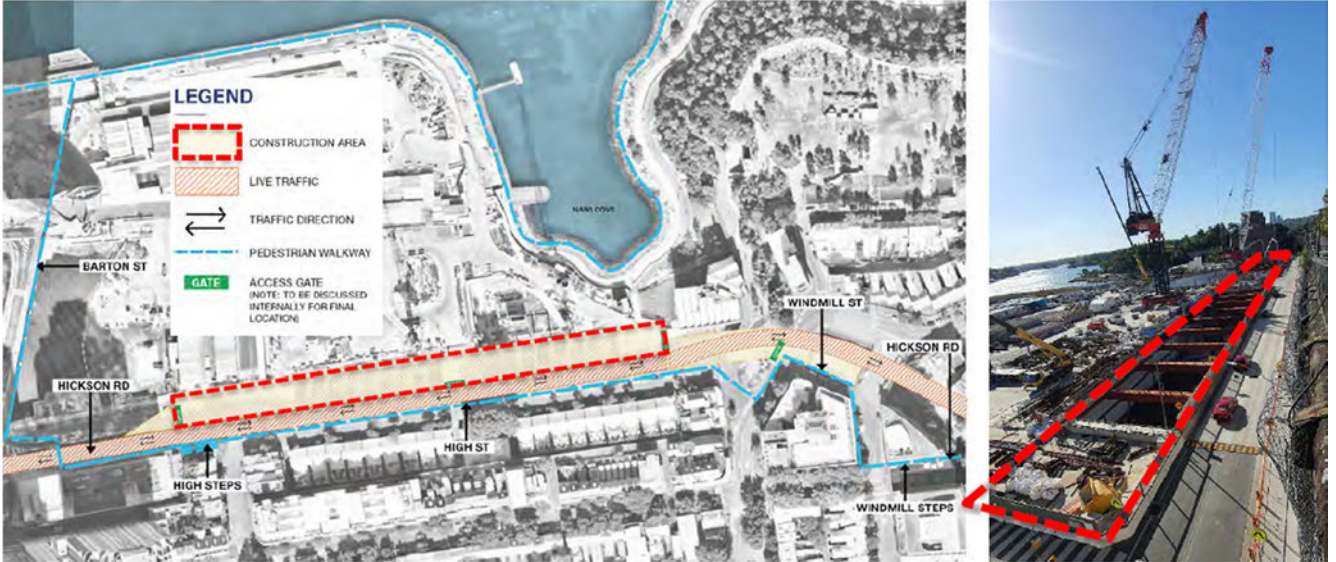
Stage 1 – Hickson Road Works – Current Arrangement Retained (Hickson Road, looking south)
